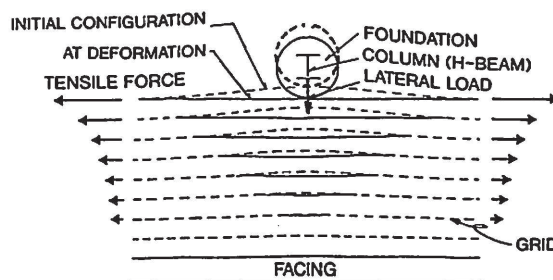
Schematic diagram showing the function of the longitudinal members of grid as tensile reinforcement to resist the lateral load from the column, the central column in the clay embankment
